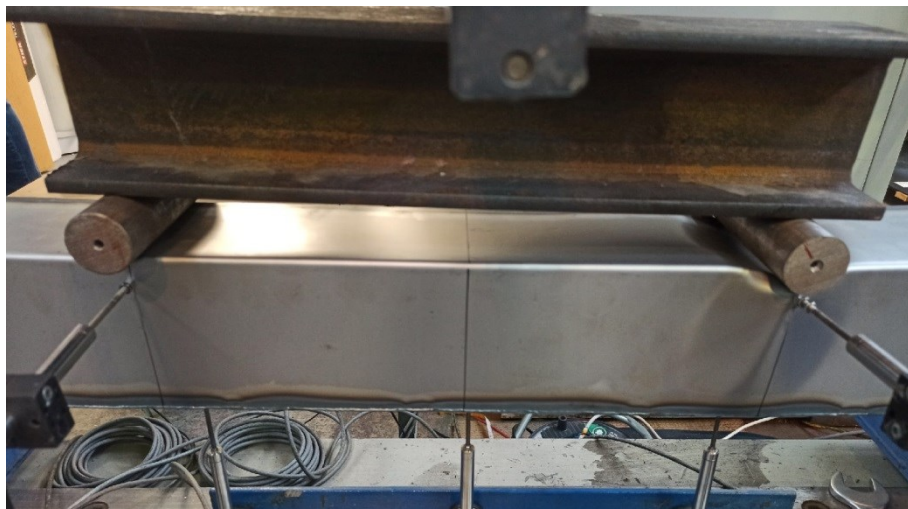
Beam 2 front view (flat 1.25 mm)
